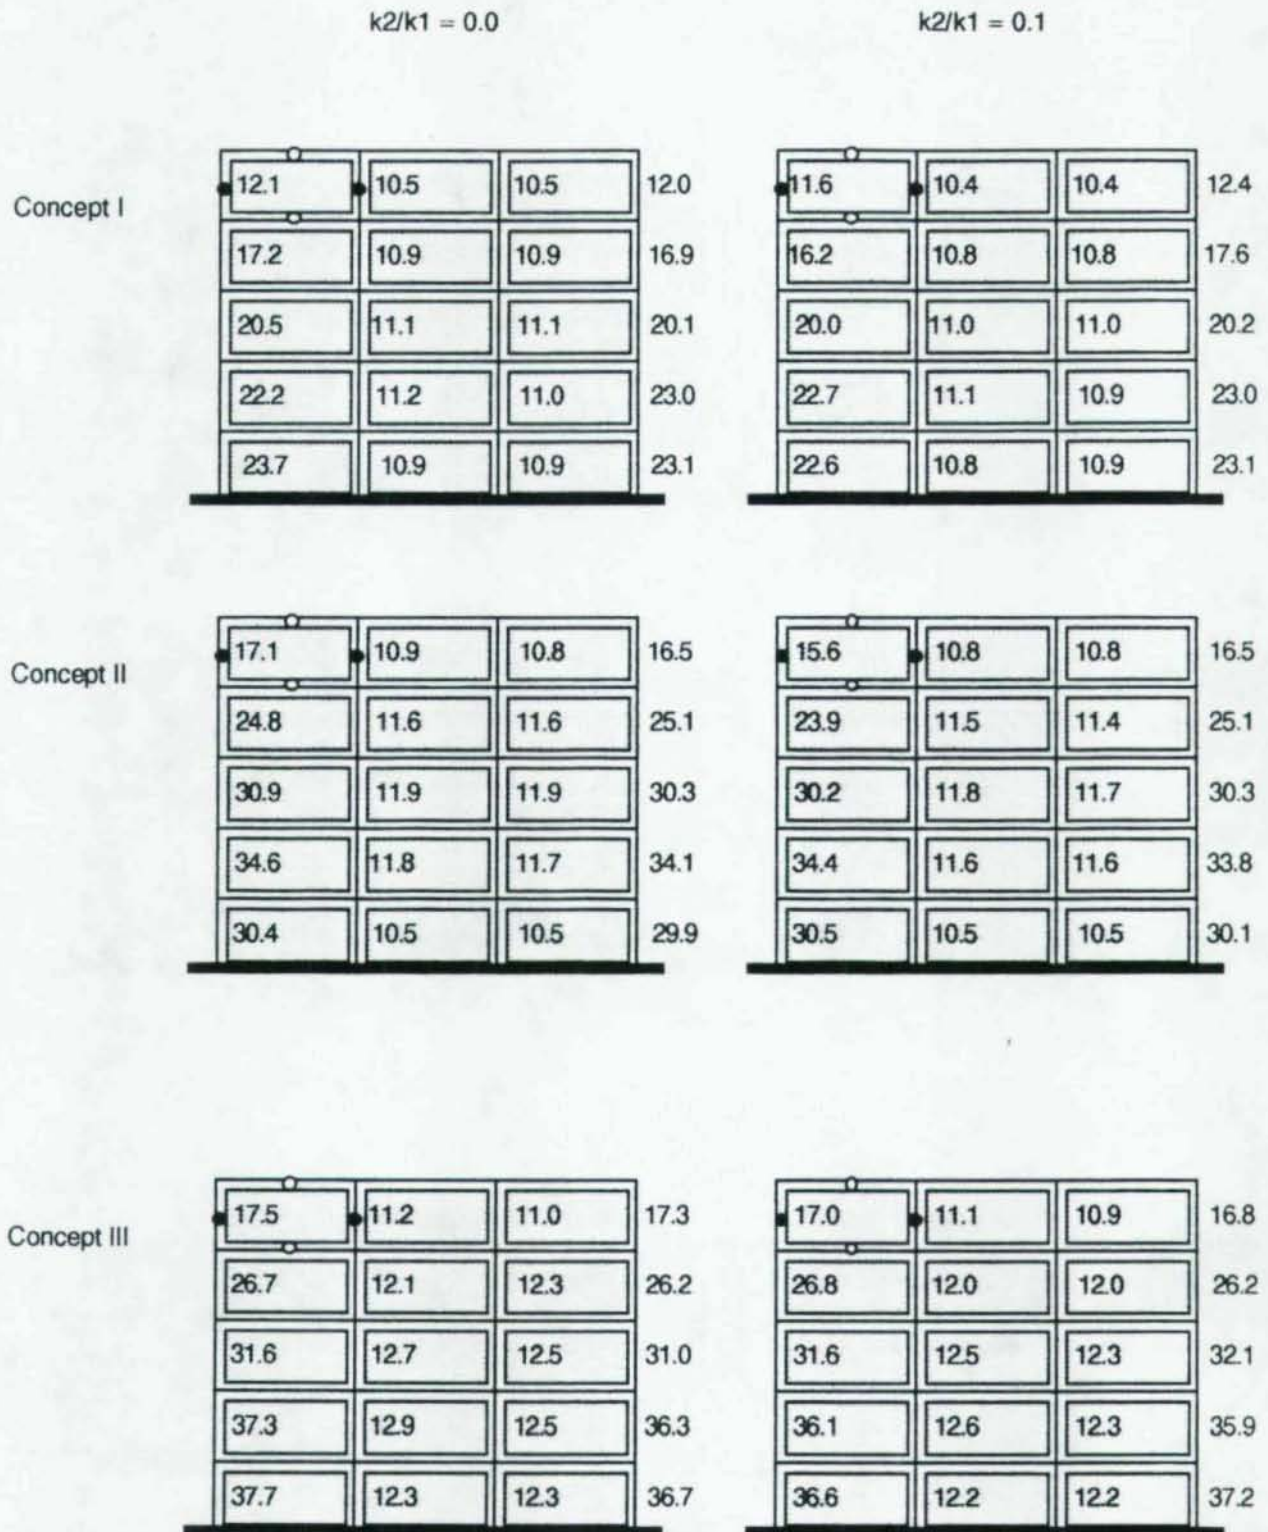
Clad Frame A: Envelopes of Forces (kips) in Side Panel Connections
